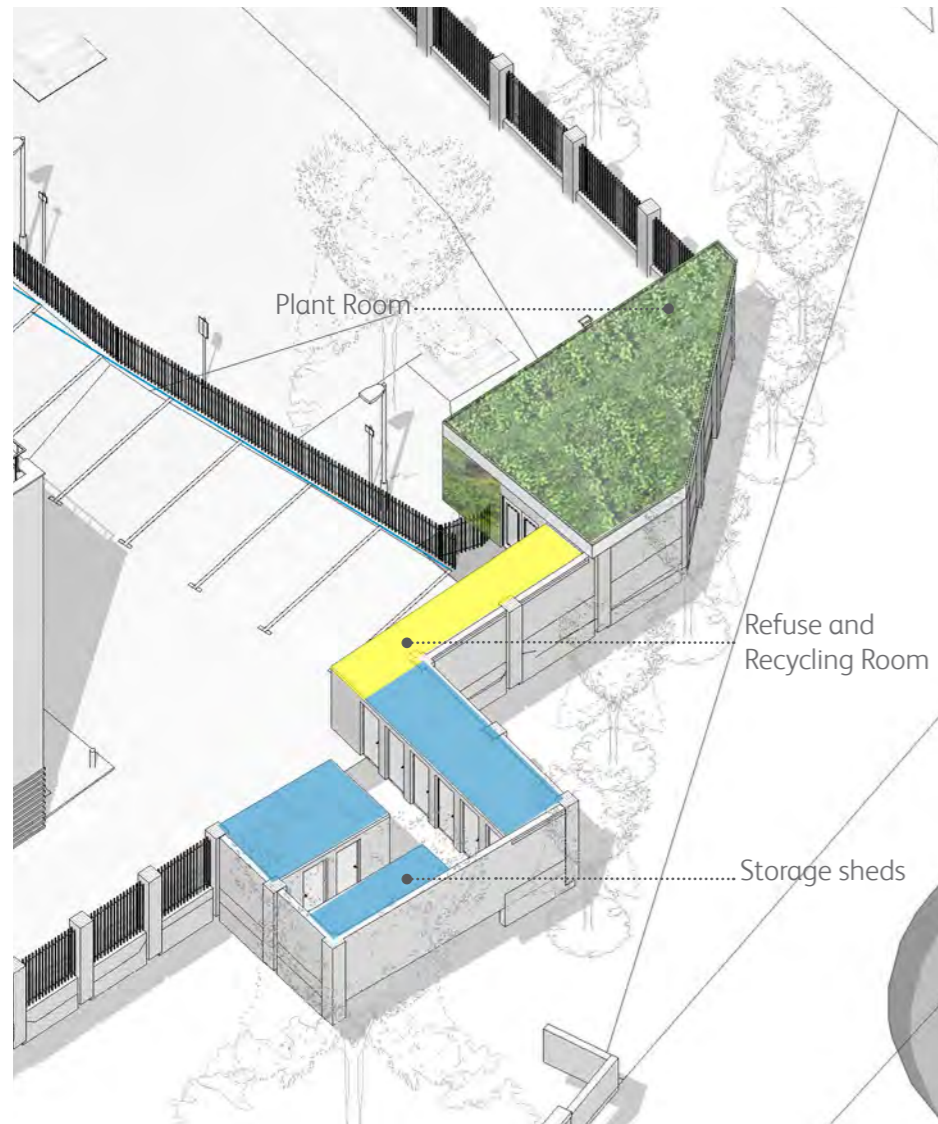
3D Visual of the Plant Room and Refuse & Recycling Store - Option 2
